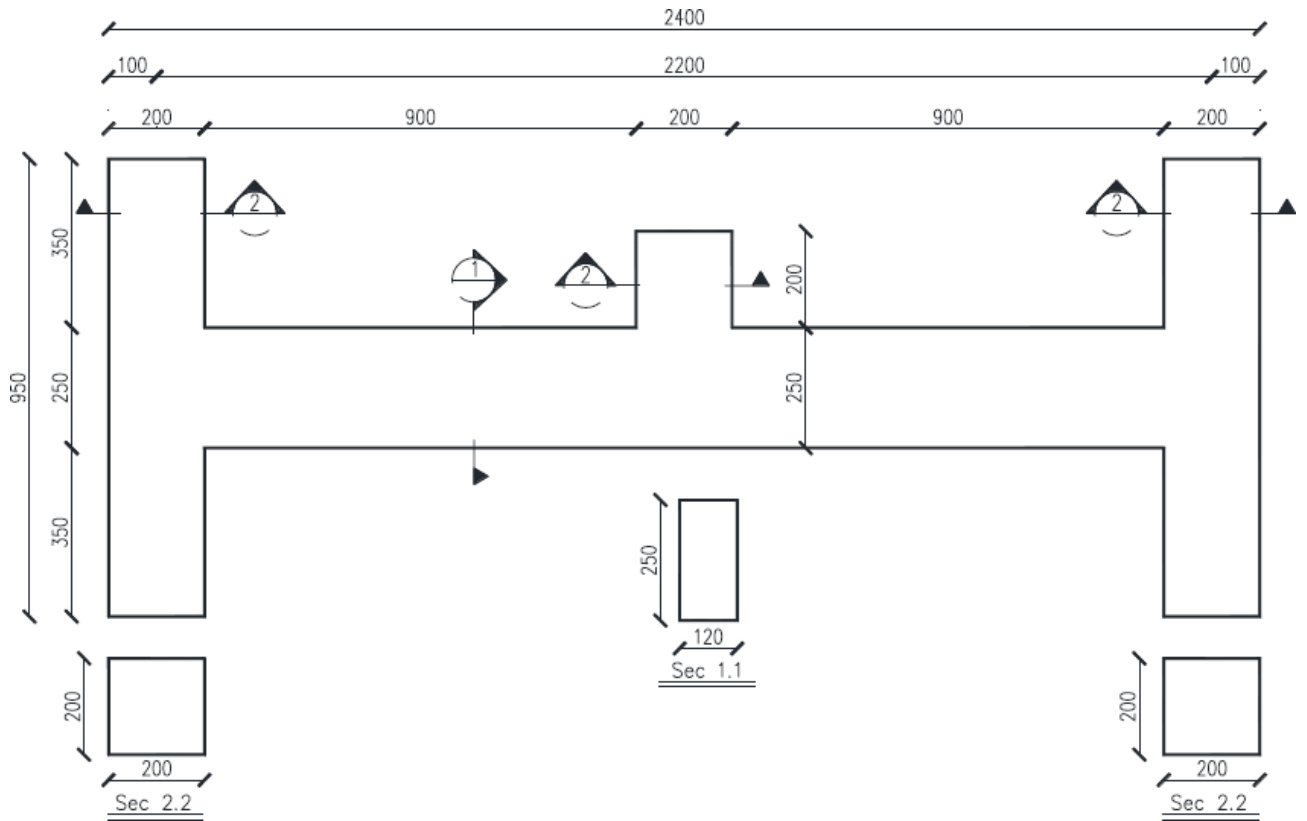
Specimen concrete dimensions (Dimensions in mm).
